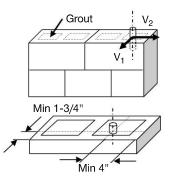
KWIK Bolt 3 installed in the top of masonry walls
